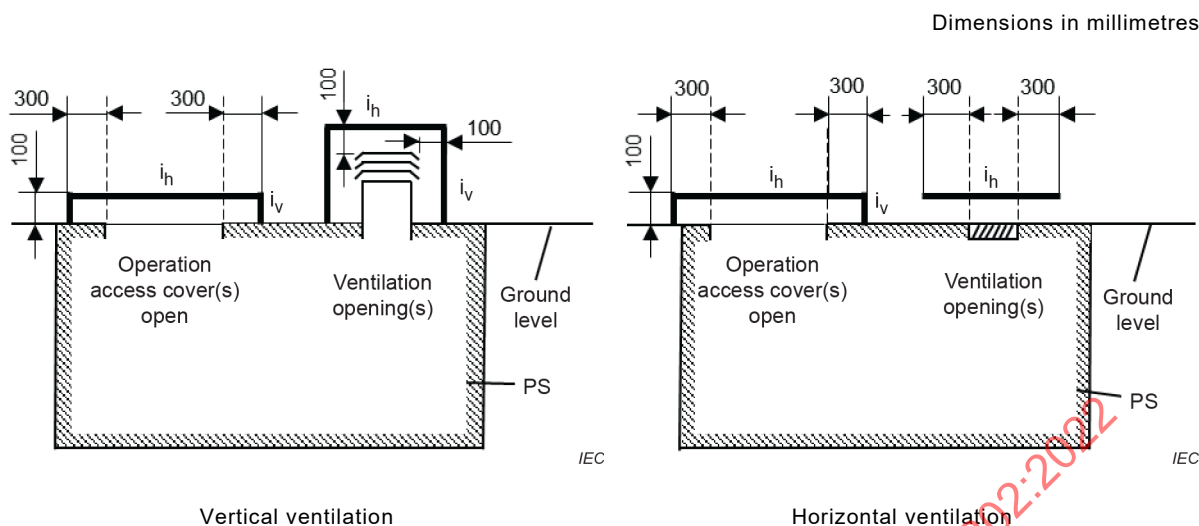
k – Protection of operators in front of the open manhole in a non-walk-in type underground prefabricated substation
